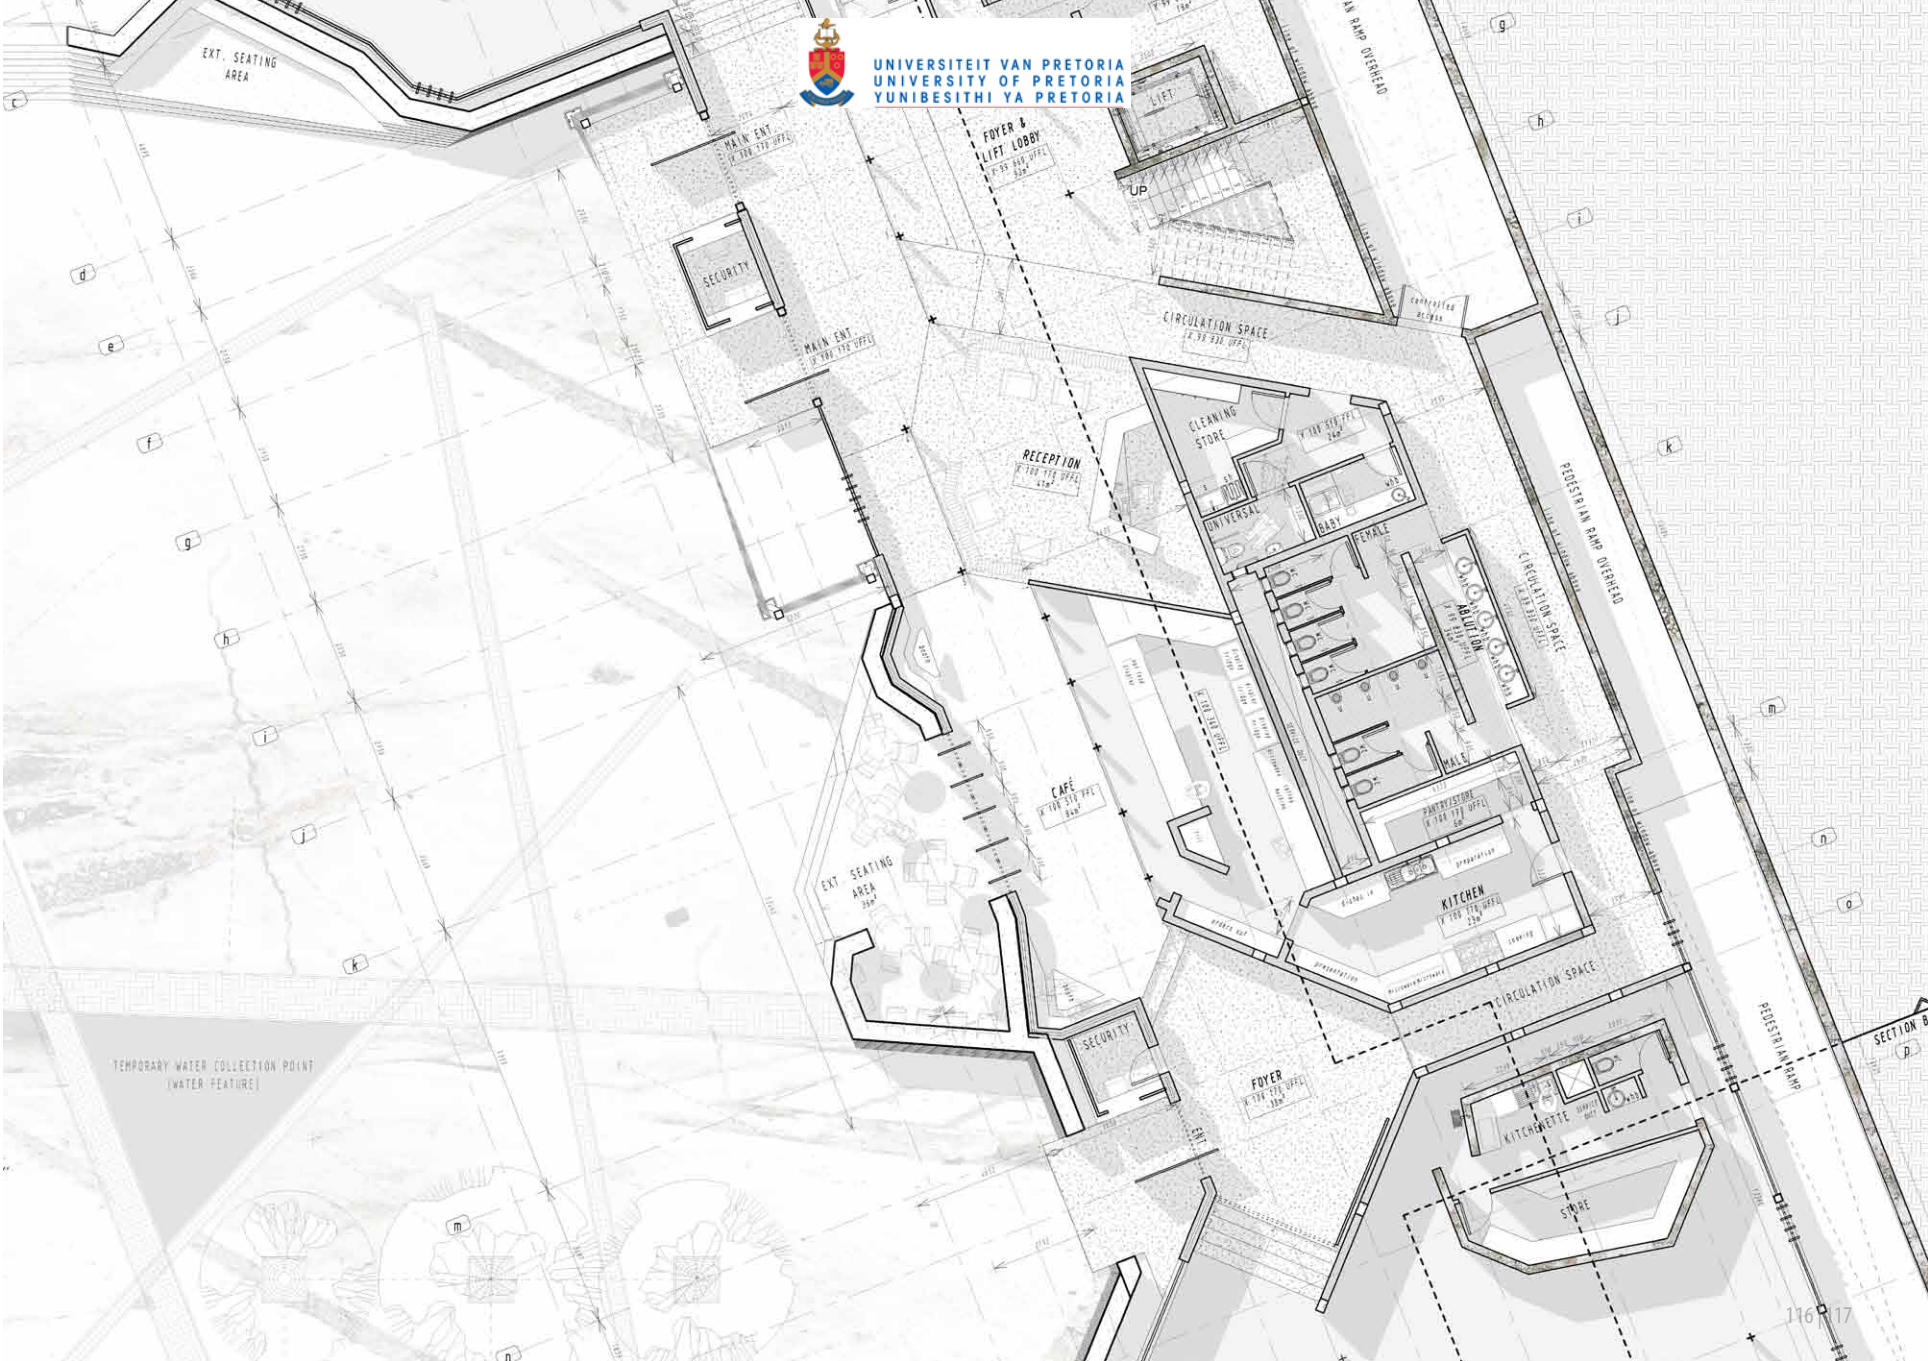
Lower Ground Floor Plan (Author, 2011)
